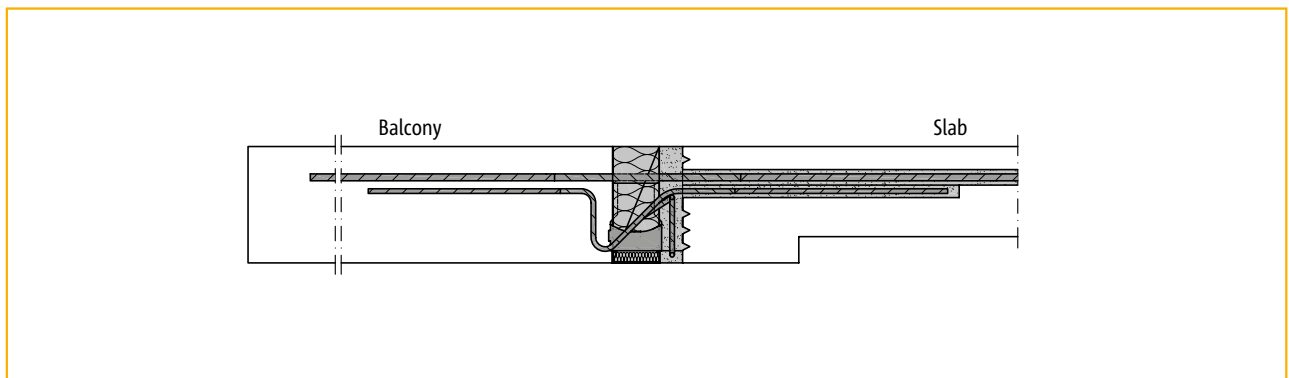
Balcony freely cantilevered with indirect support with renewal of an existing balcony
